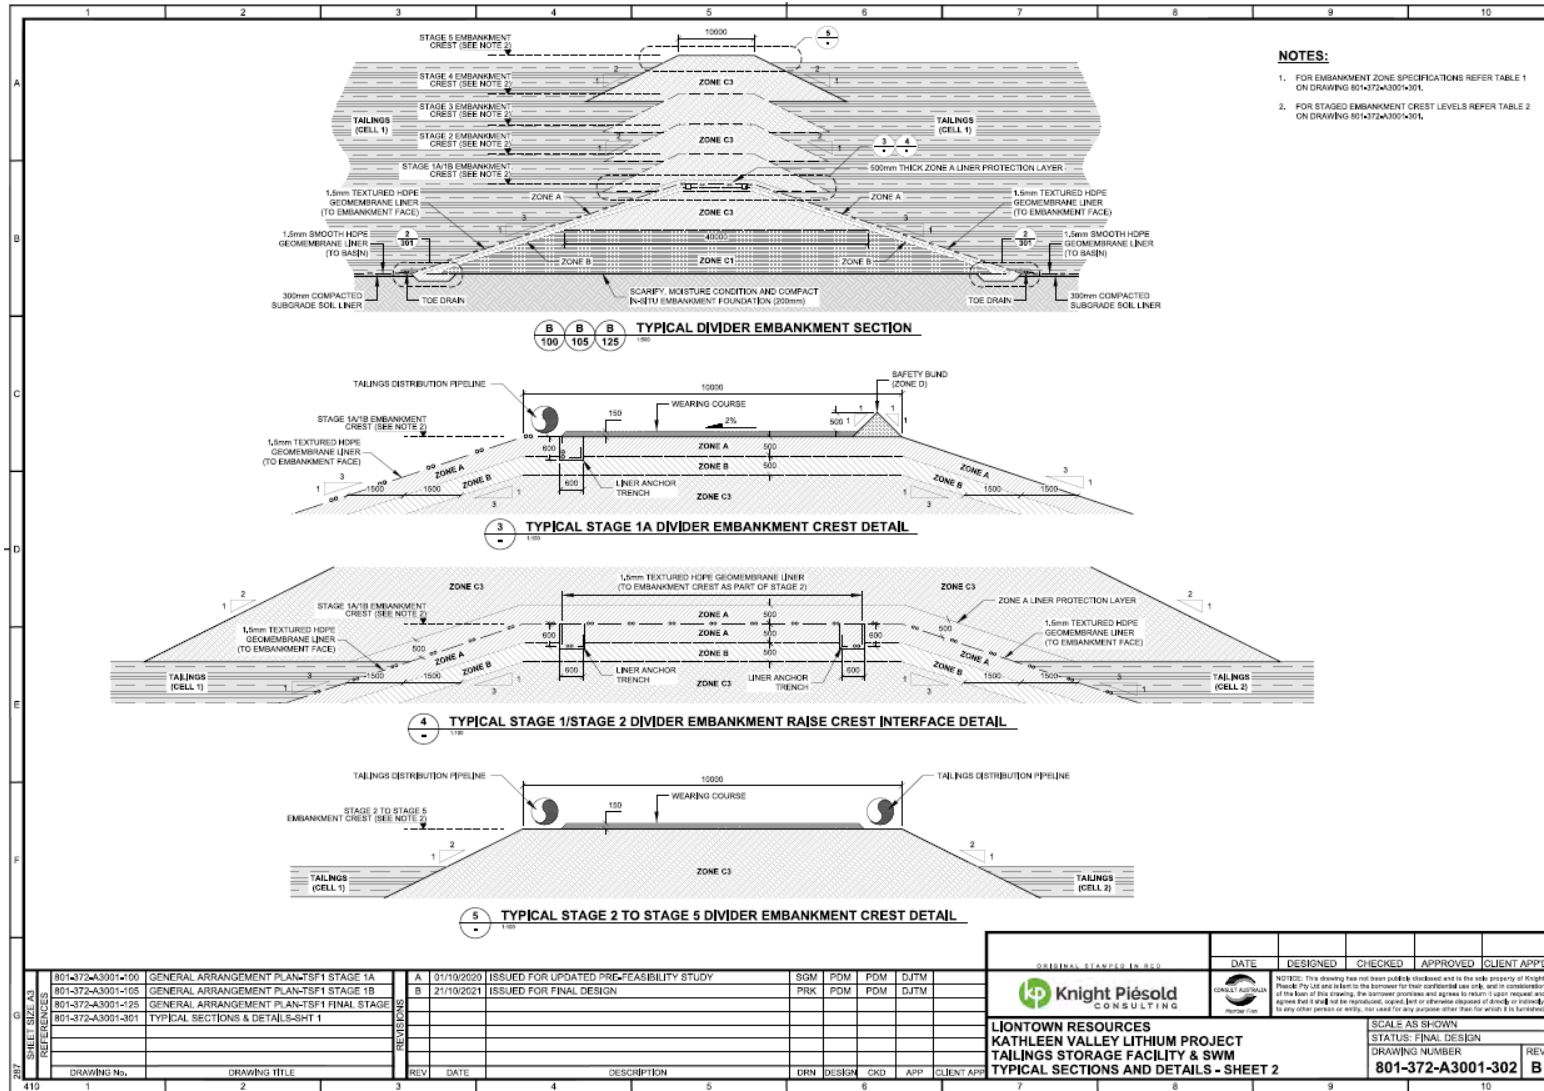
Tailings Storage Facility Typical Section Detail – 801-372-A3001-302
